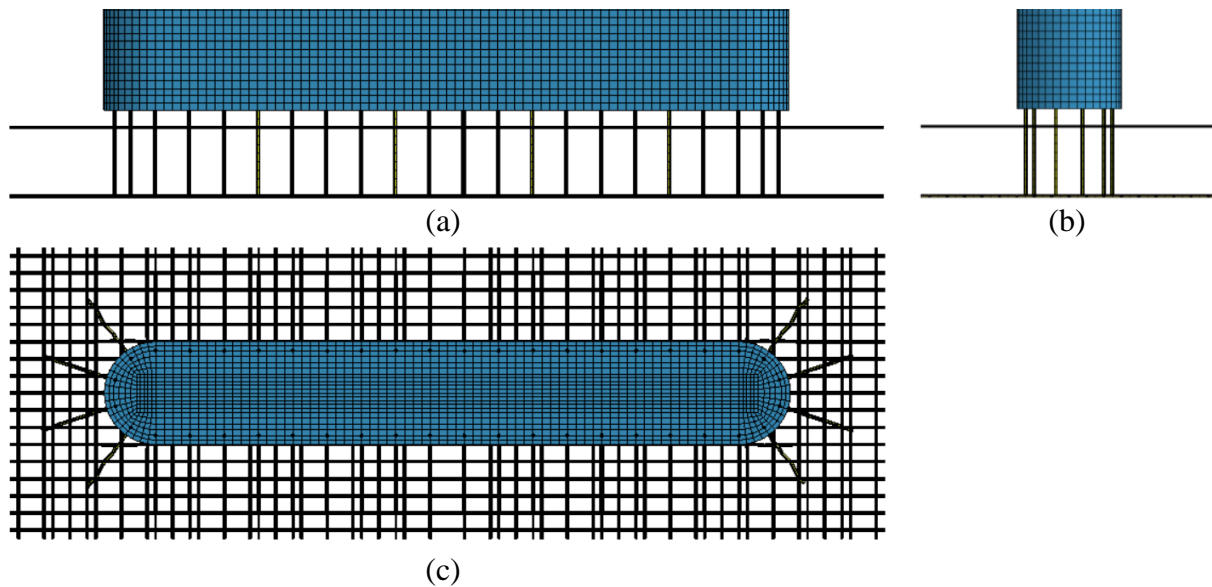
Steel reinforcement details of T-pier's pile cap: (a) side view from road, (b) view in column's longitudinal axis, and (c) top view
